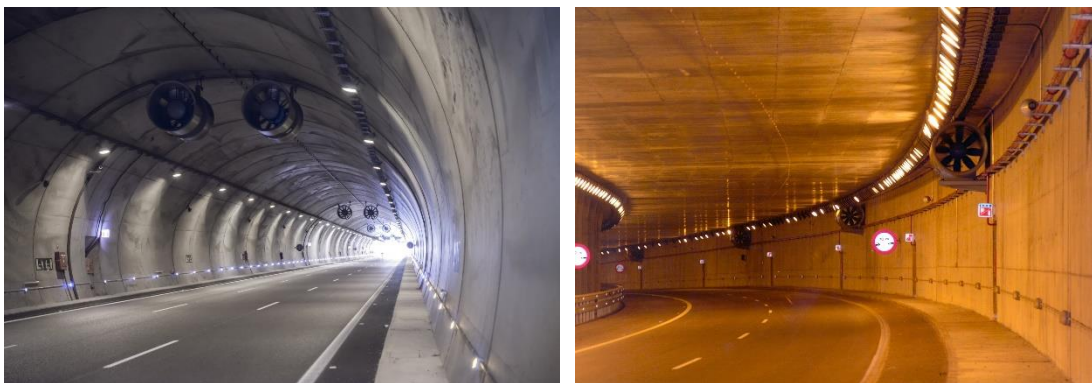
View of two different Jet Fan arrangements, inside modern tunnel structures.
